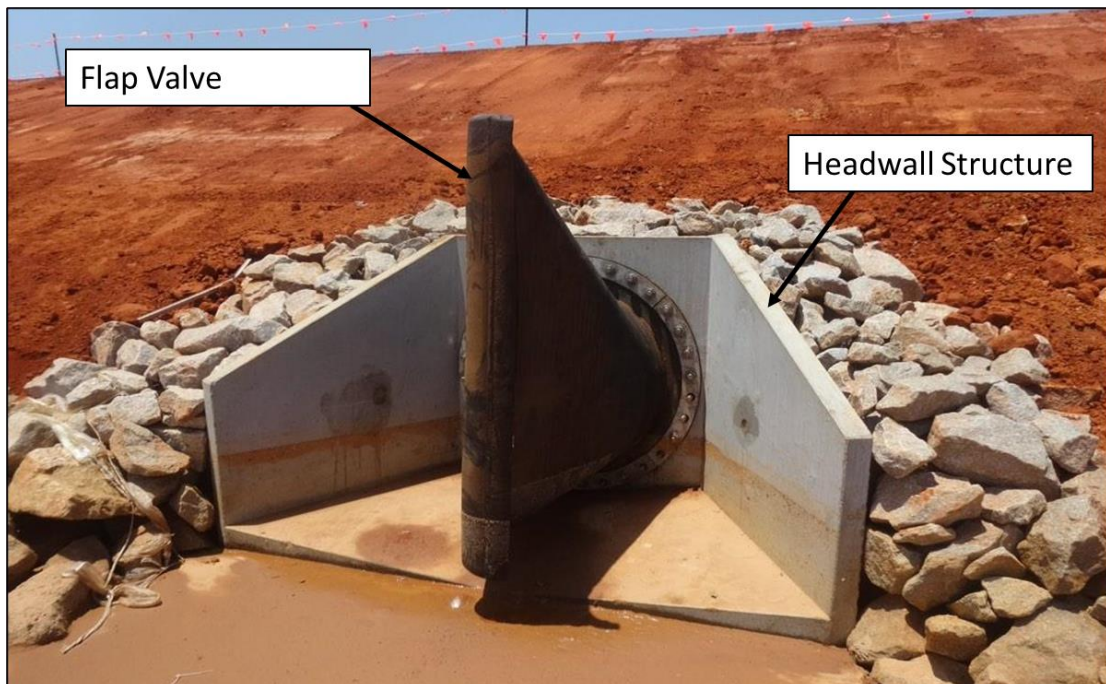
Example of a drainage outfall fitted with a flap valve protruding from a headwall structure
